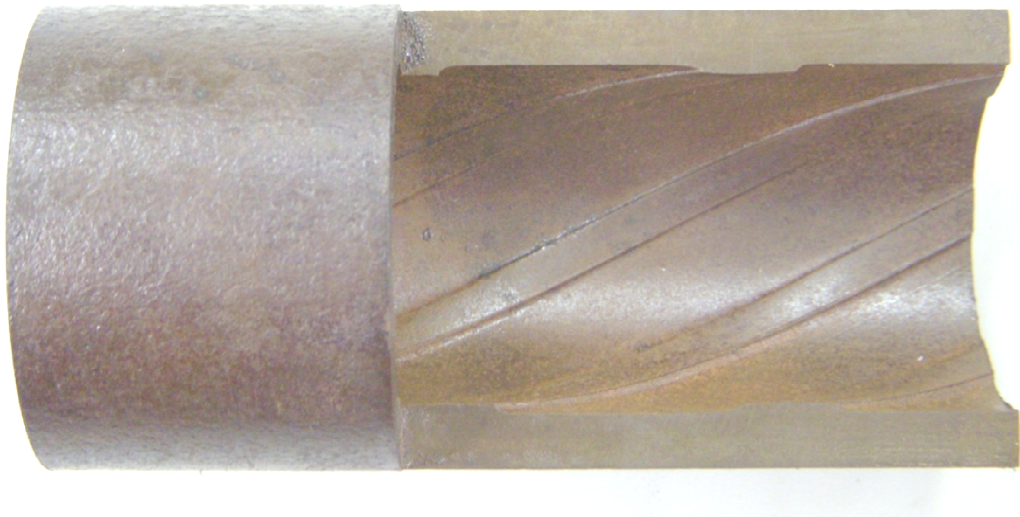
Rifled tube also known as helically internally ribbed tube.
